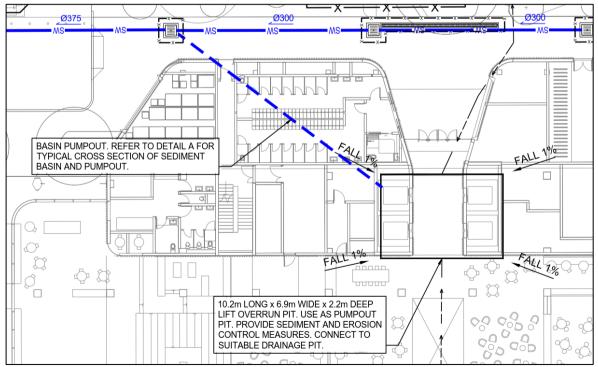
Pump Out Pit Outlet Pipe Plan Arrangement
